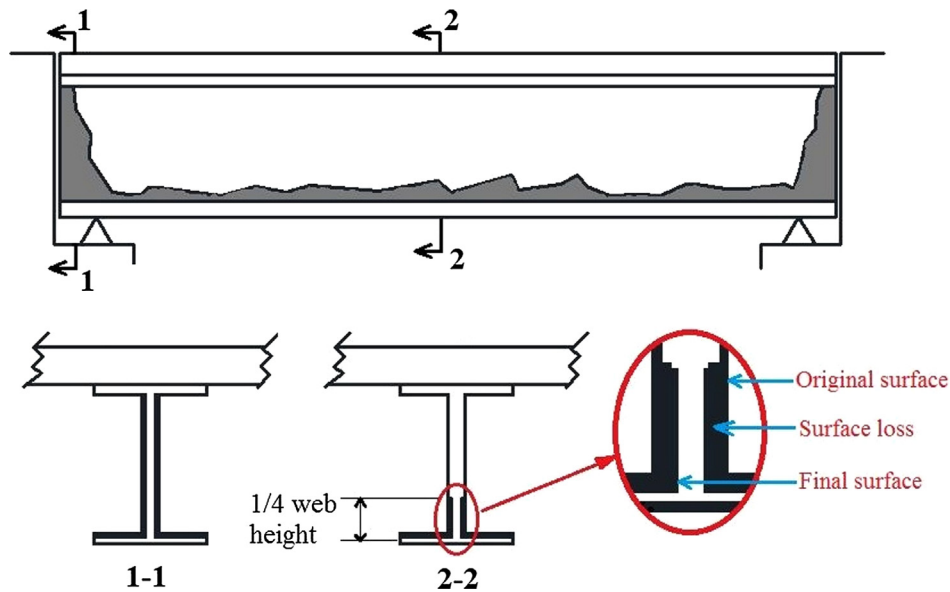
Typical locations of corrosion on the steel girder.
